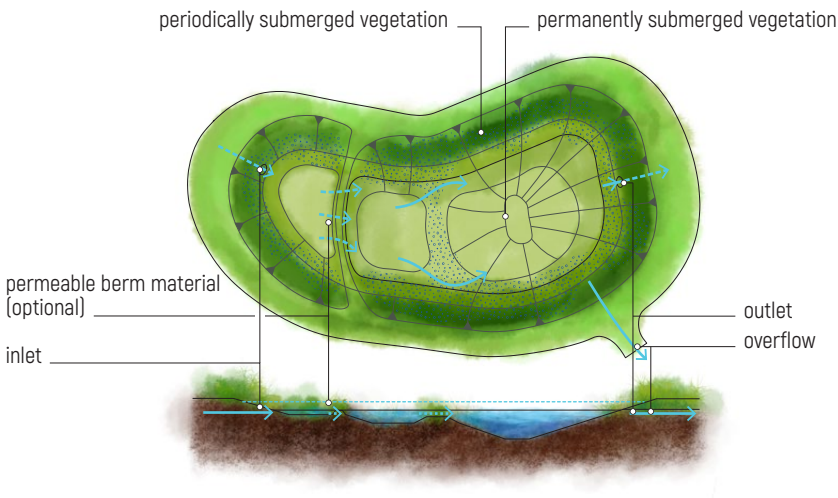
A typical pond design in plan view and profile (based on Woods-Ballard et al., 2015)
